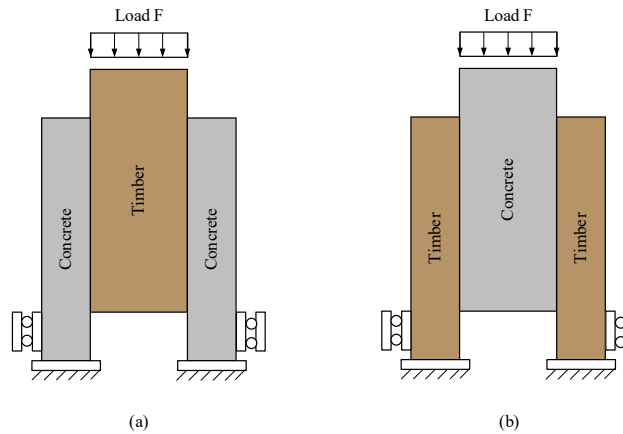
Symmetric push-out test setup with (a) timber and (b) concrete core.
